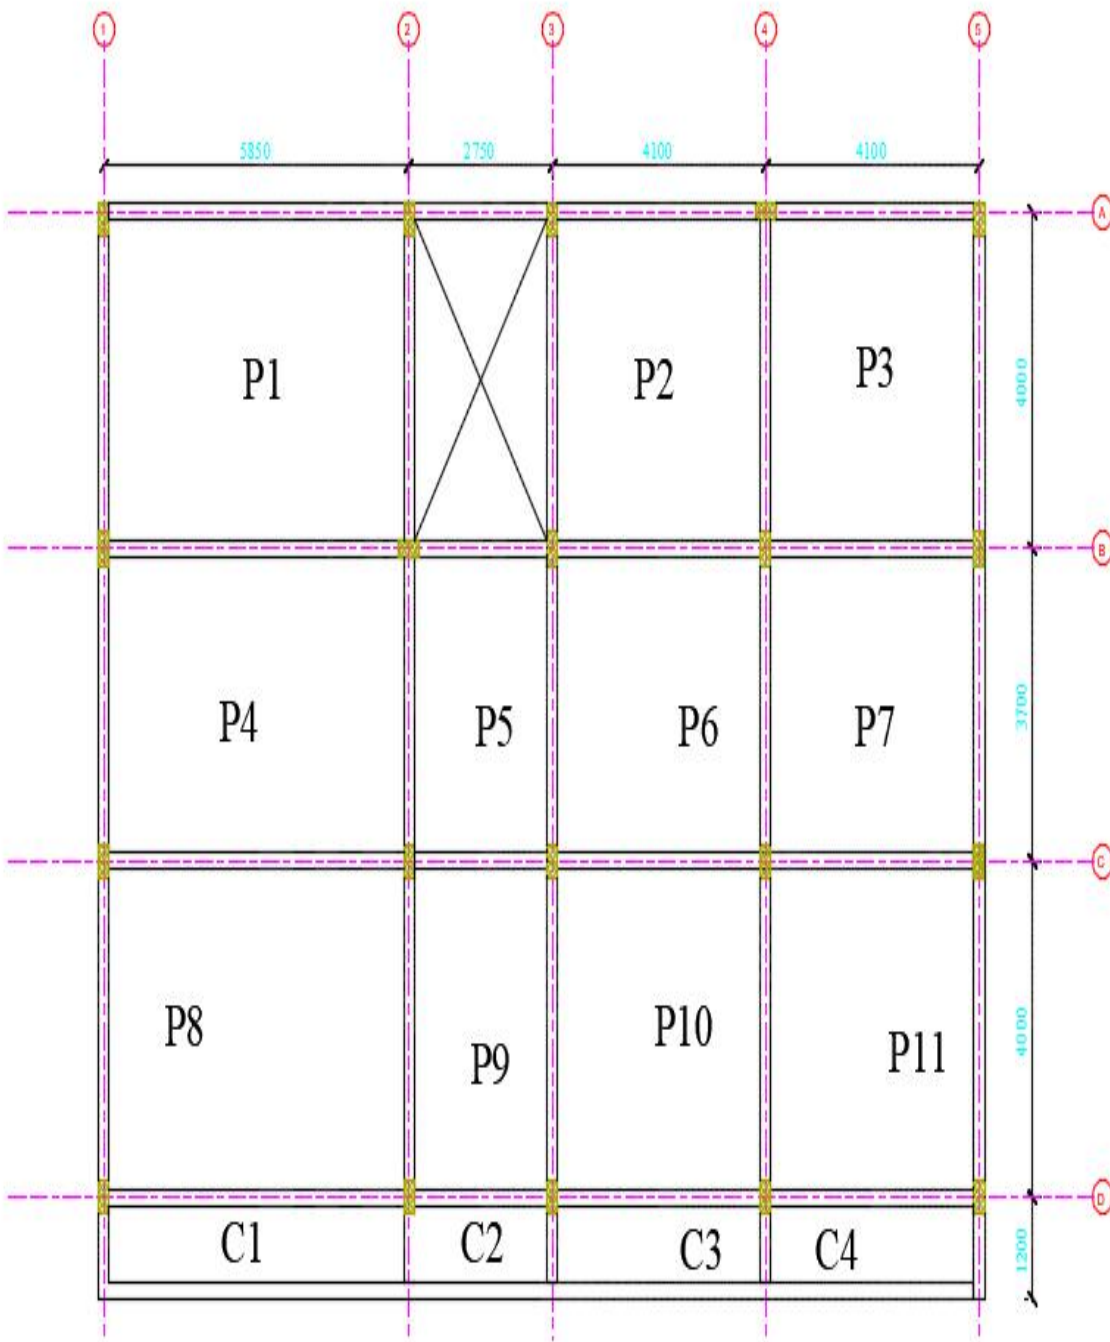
1. 2<sup>nd</sup> floor slab layout
